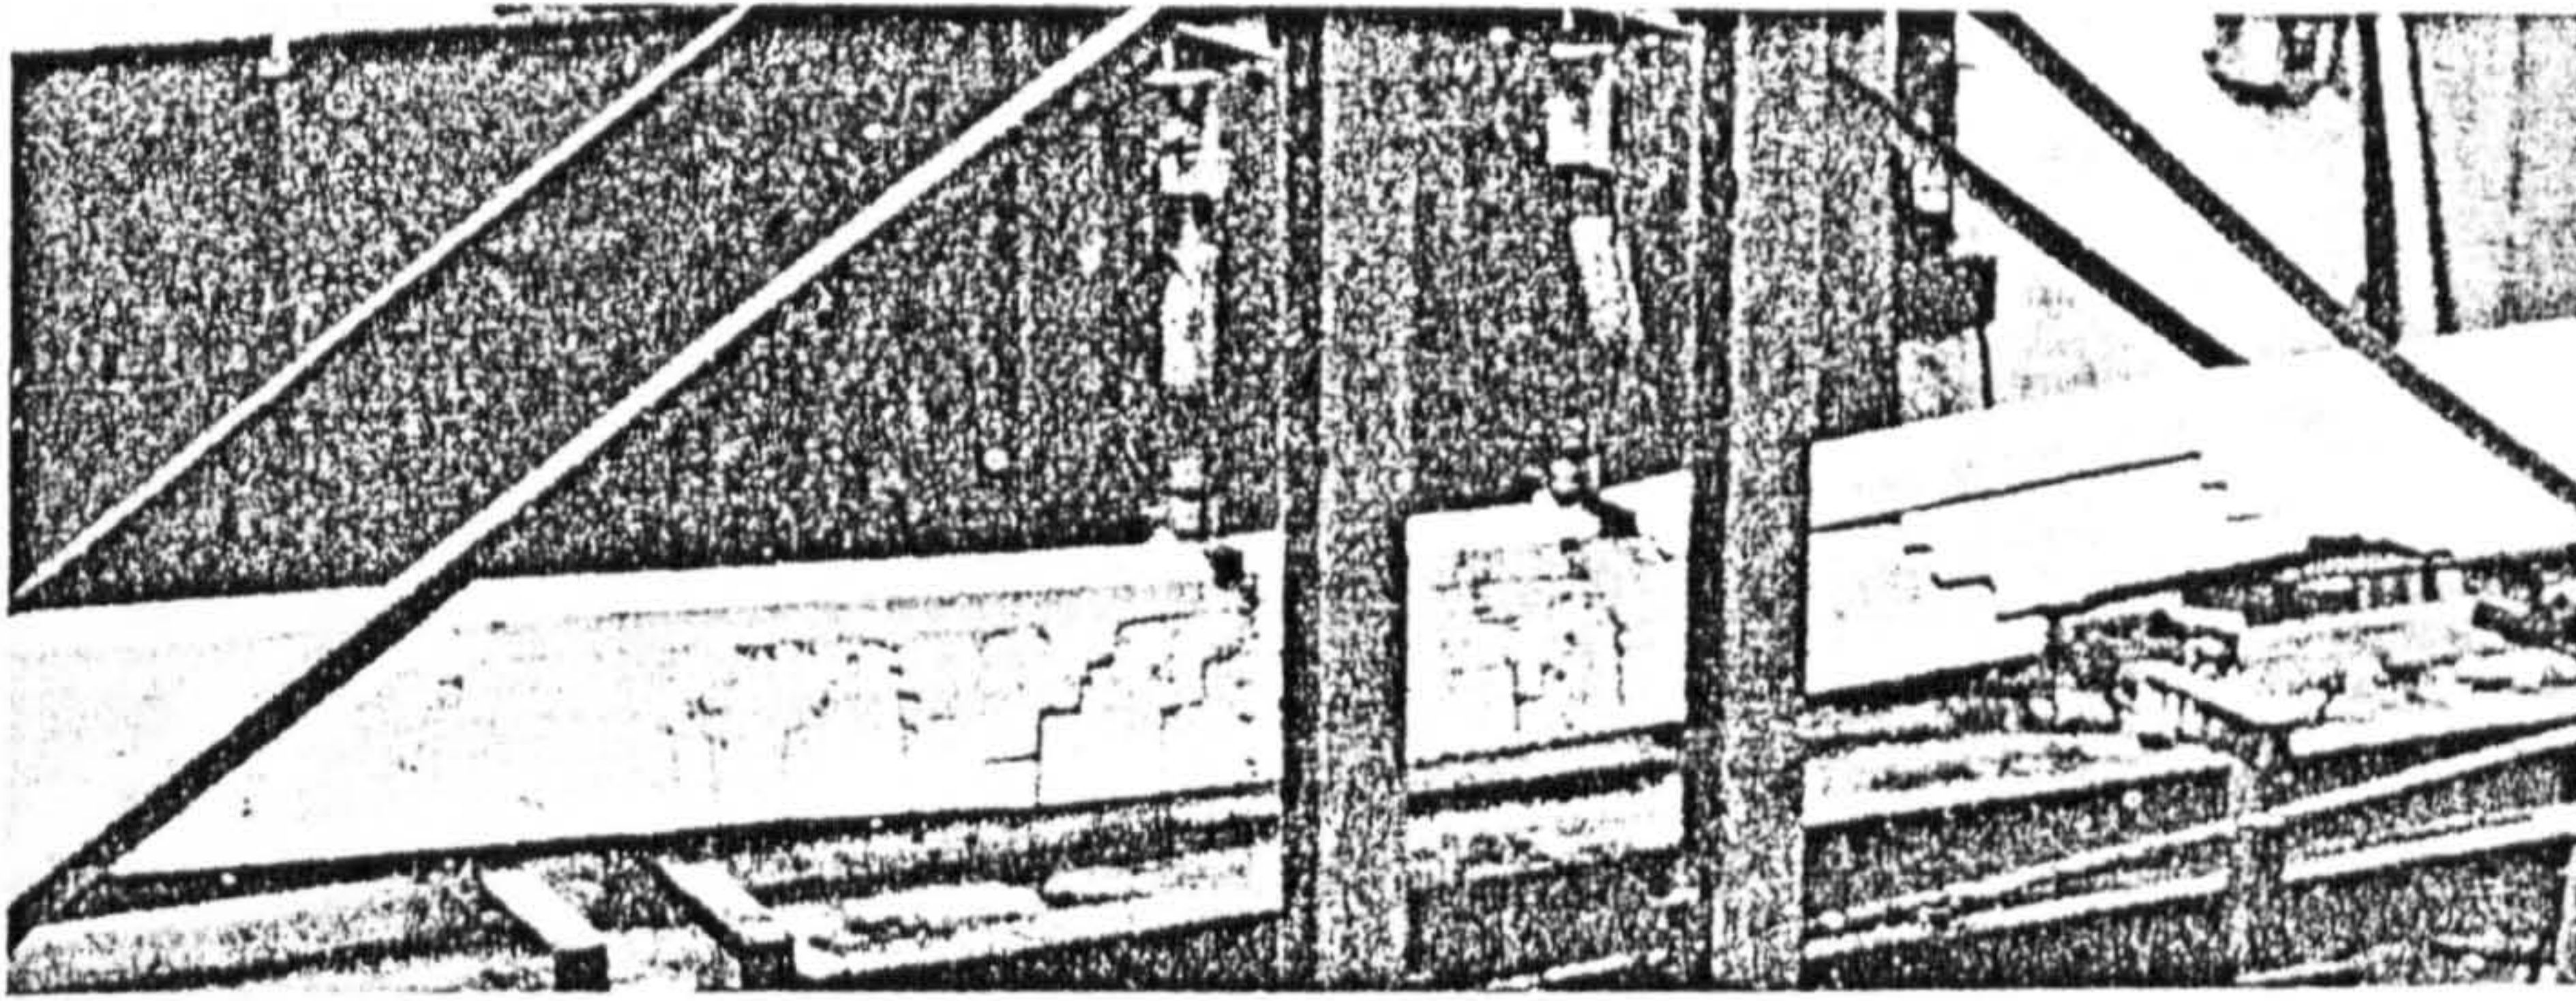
Typical secondary shear failure of reinforced brickwork beams
